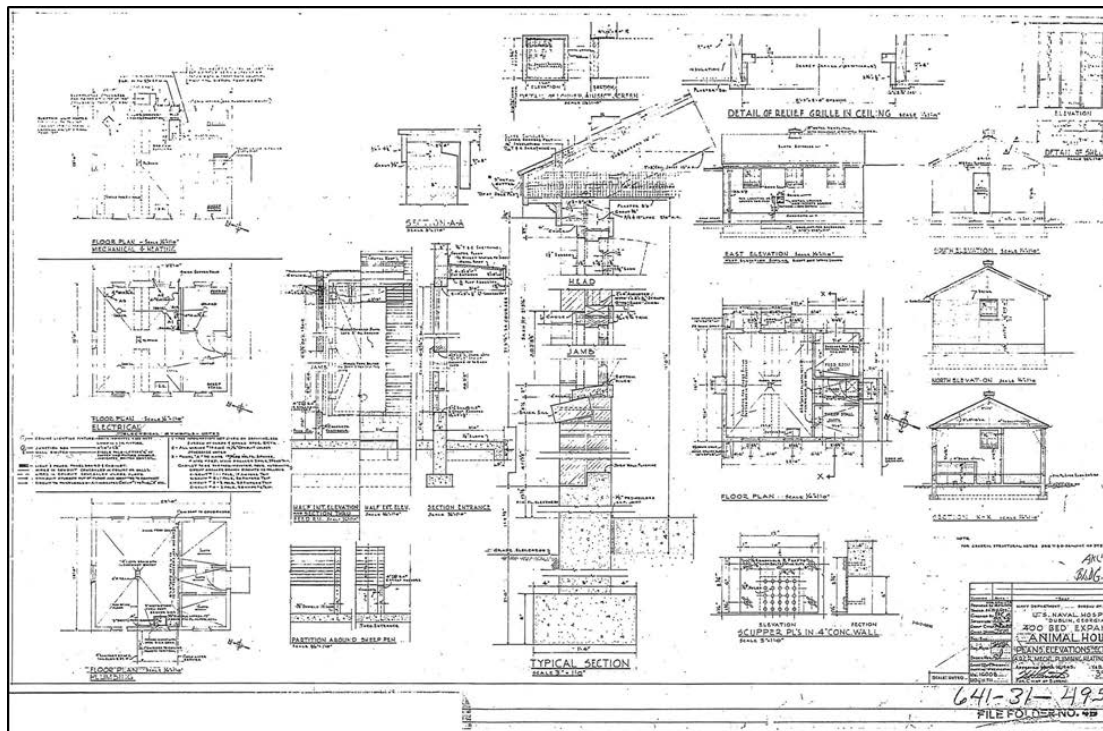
Architectural drawings for the animal house or Building No. 44 on the Dublin VA Hospital campus showing the building in plan and section (VA).
